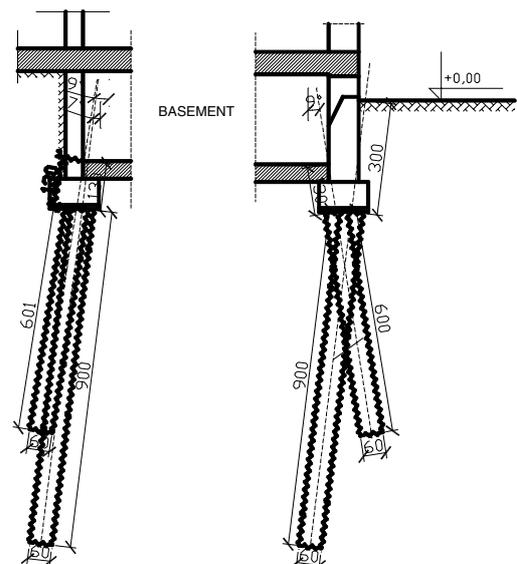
Typical cross sections of foundation with pile positioning and dimensions.
